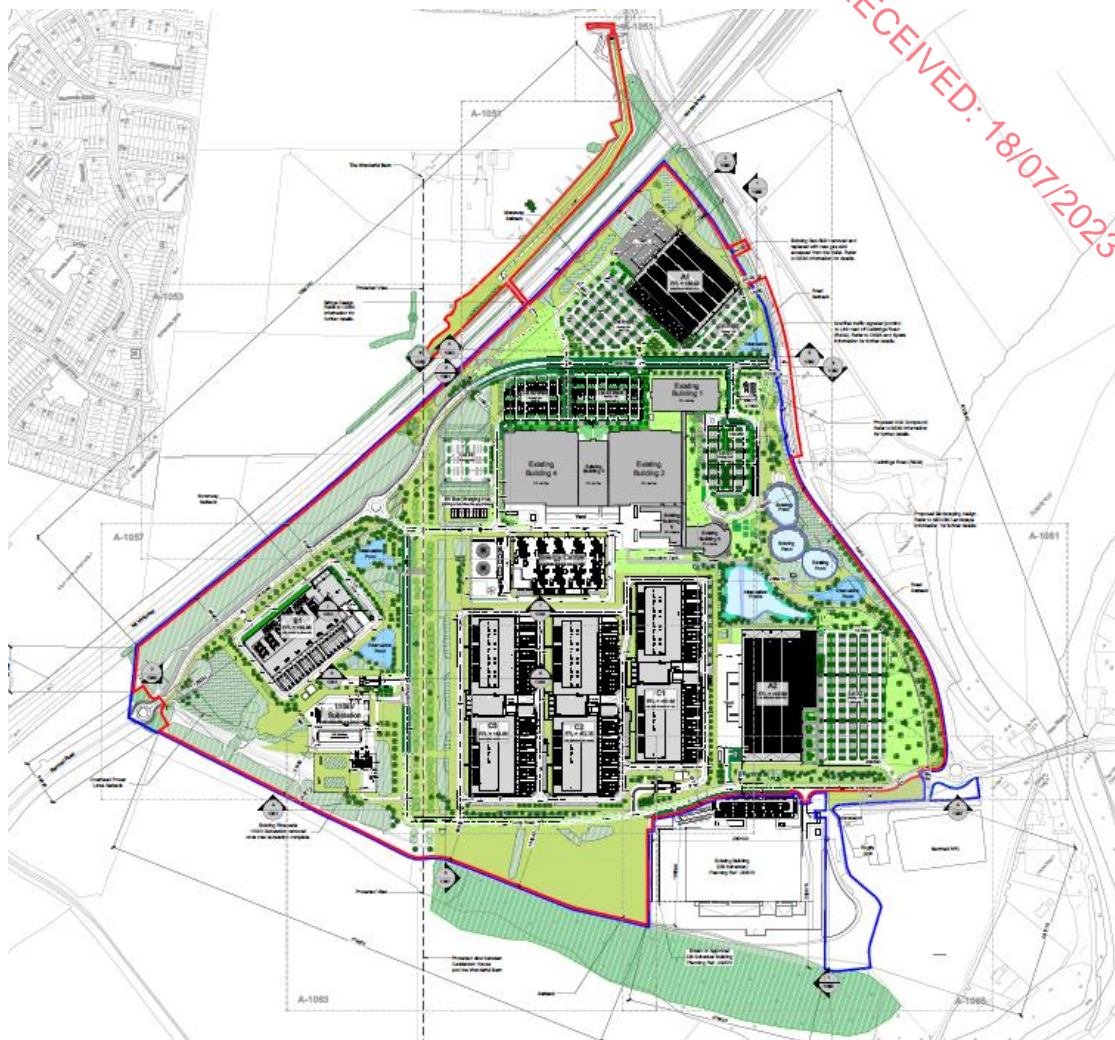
Final Site Layout Plan (Masterplan). (Source: RKD Architects.)
